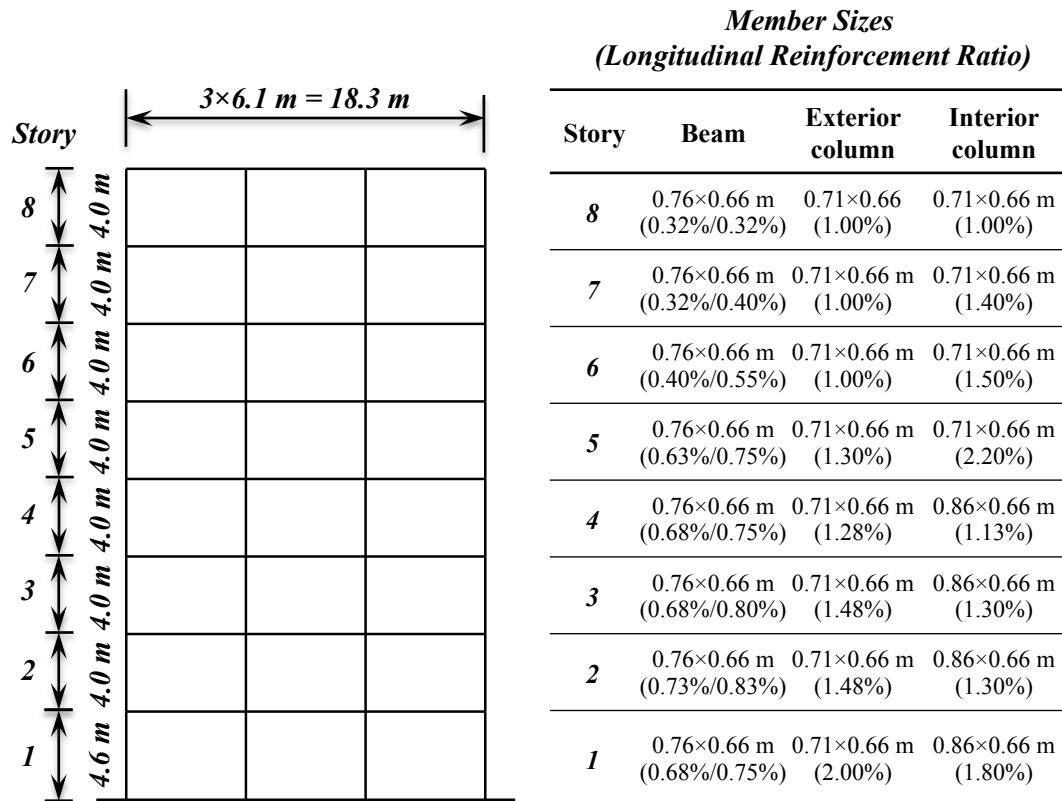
Elevation of building RC-8 as well as the member size and reinforcement ratio of the beams and columns.
